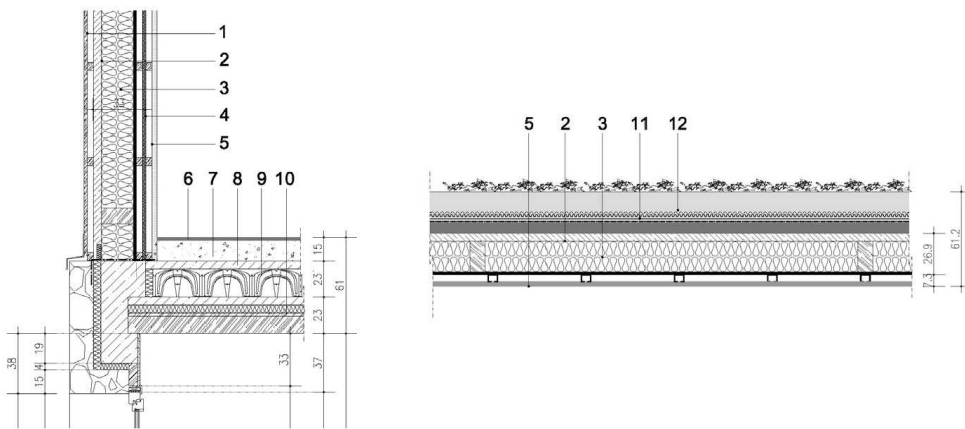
Construction details. 1- Floorboards pine, 2- Concrete, 3- Polystyrene, 4- Reflective multilayer insulation, 5- Double plasterboard, 6- Ceramic floor covering, 7- Light concrete, 8- Concrete, 9- Air gap, 10- Wood floor structure, 11- Membrane protection and root barrier, 12 – Sedum roof.
